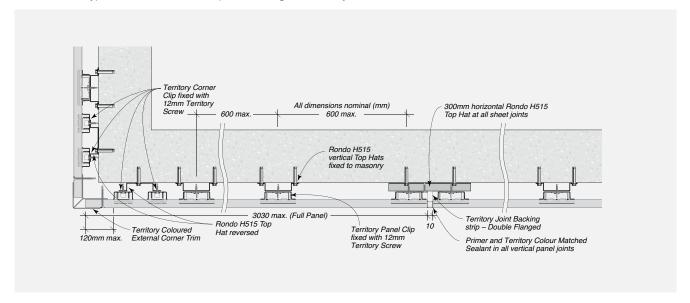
Typical Territory System Cross Sectional Detail for Steel Framing where Face Fixing is required – Elevation
